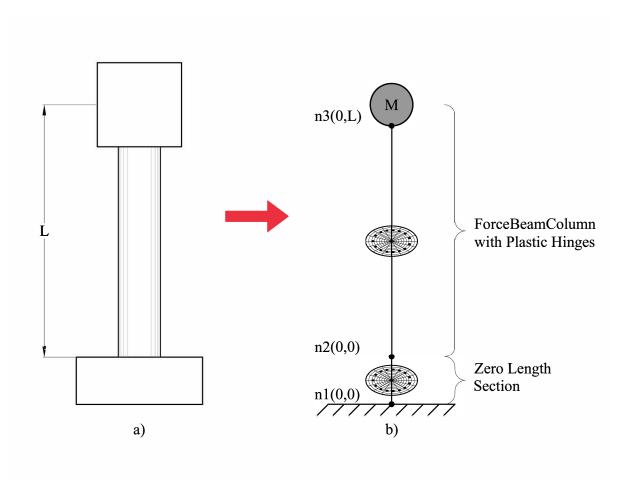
Structural Model a) SDOF Column b) Structural Model
